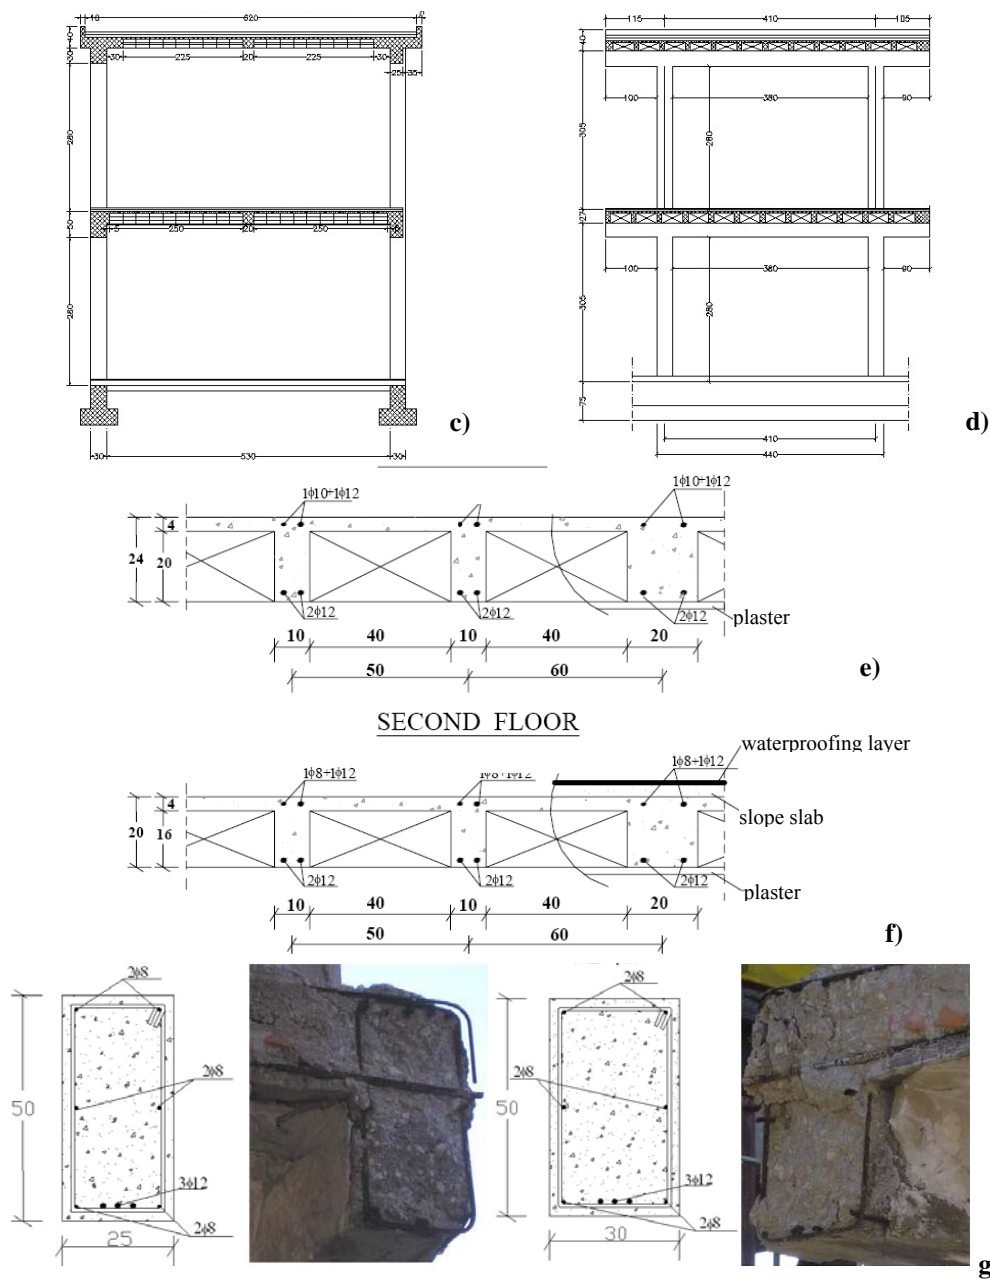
Geometrical characteristics and some structural details of module n. 5: first level (a) and roof (b) floors, transversal (c) and longitudinal (d) sections, first floor (e) and roof (f) slab cross-section, first level (g) and roof (h) beams and column cross-section (i) (continues)
